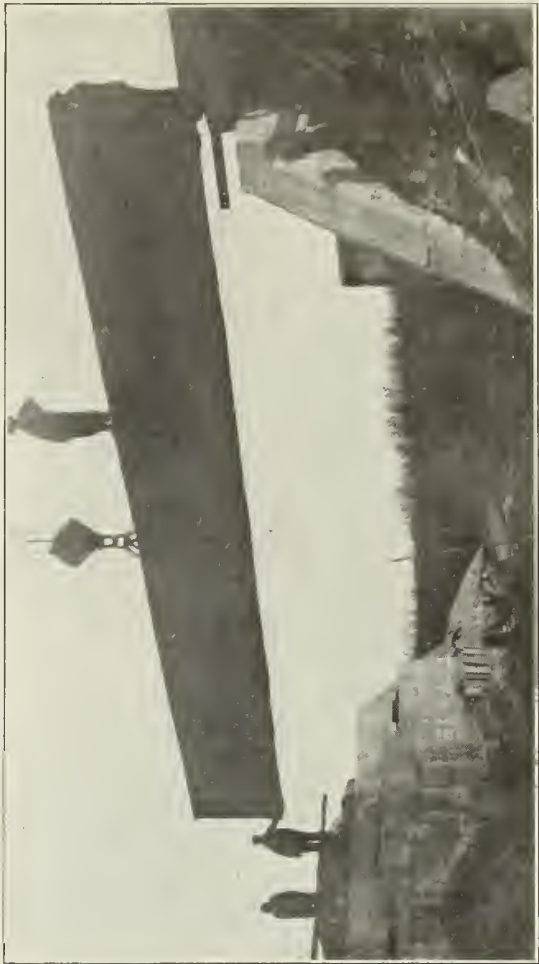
Setting In Girders at Boucher Creek Bridge, N. T. Ry.
